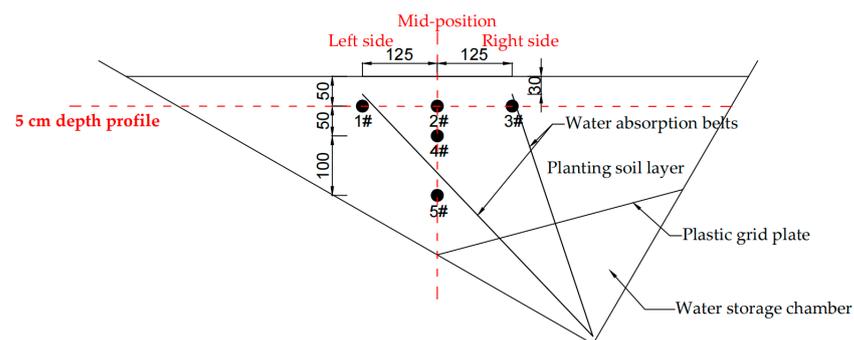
The water content measuring points in the slab trench model with water absorption belts (unit: mm).
